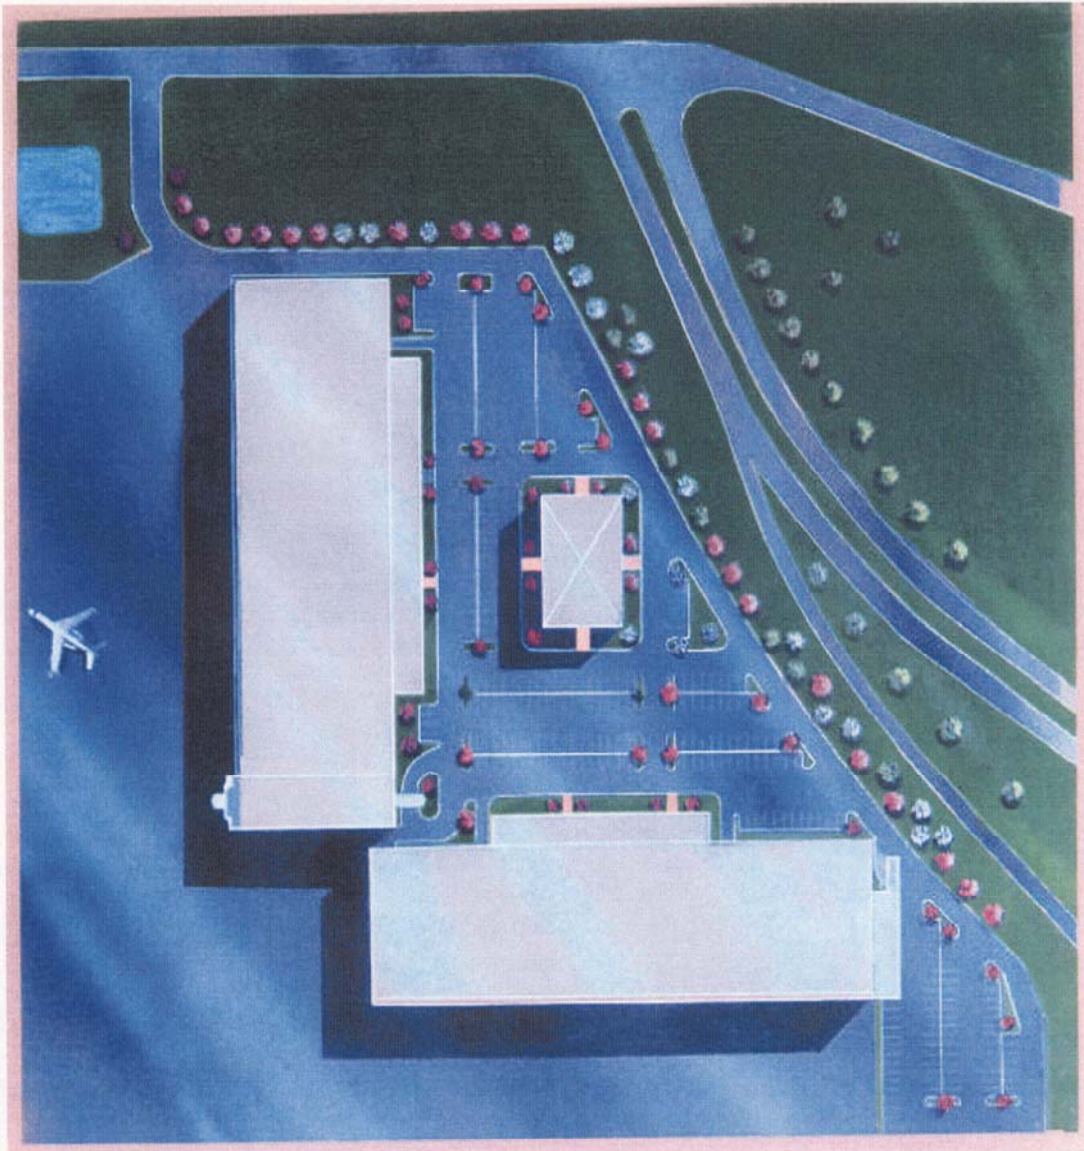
Signature/Landow Hangar Complex – Rendered Site Plan
